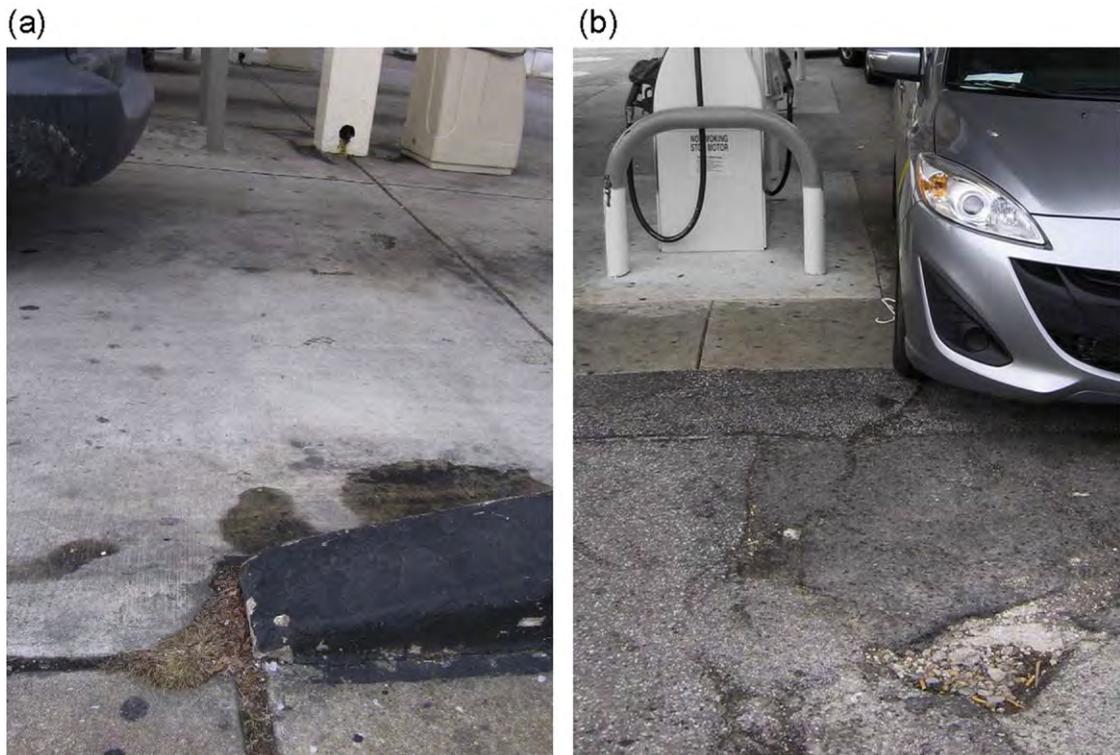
(a) Concrete pads at gas stations are often covered by numerous hydrocarbon stains that in this case are even present on an adjacent public sidewalk. (b) Pavement close by dispensing stations can be cracked or damaged and could facilitate the transfer of spilled hydrocarbon into the subsurface.
